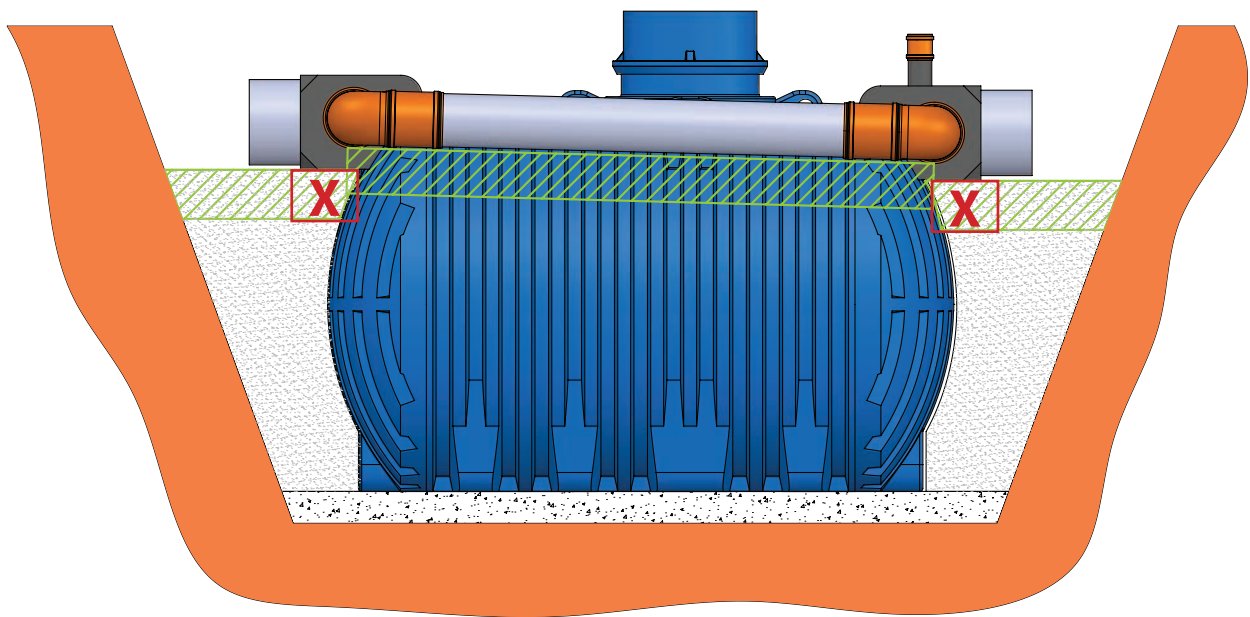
Areas where the backfill layer must be carefully placed and compacted. The area marked with X must be executed with dry concrete.
